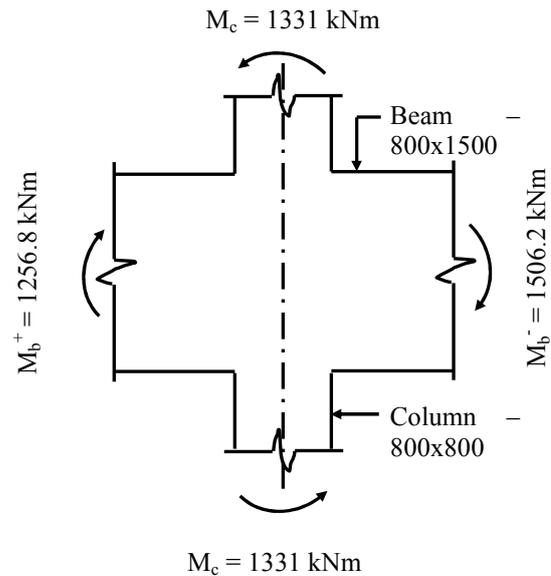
Design Flexural Strength at the Column/Beam Joint
